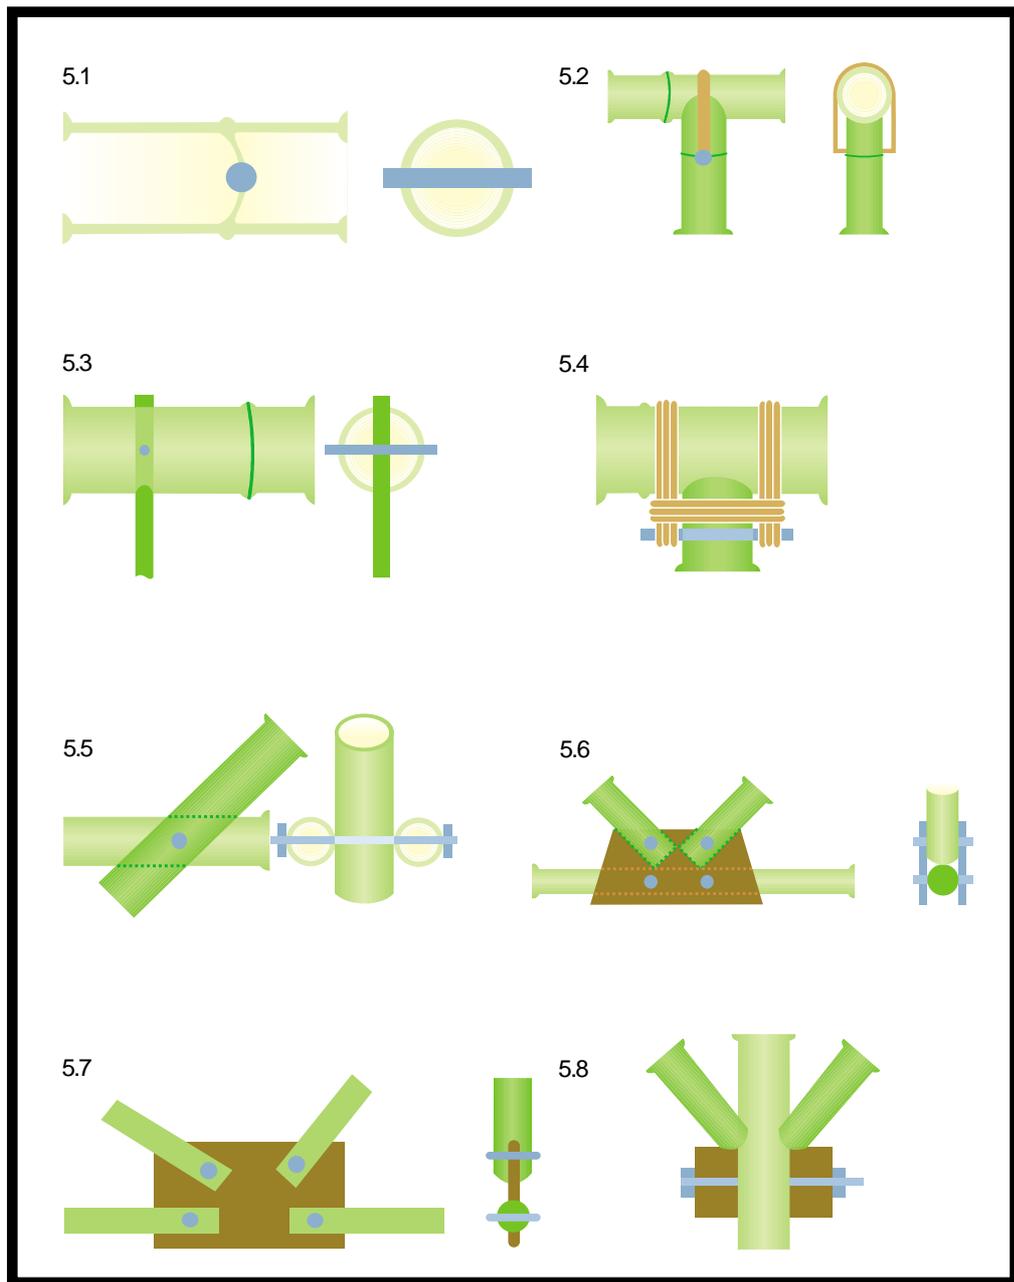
Joints from cross-section to an element perpendicular to the culm (Janssen 1981)
